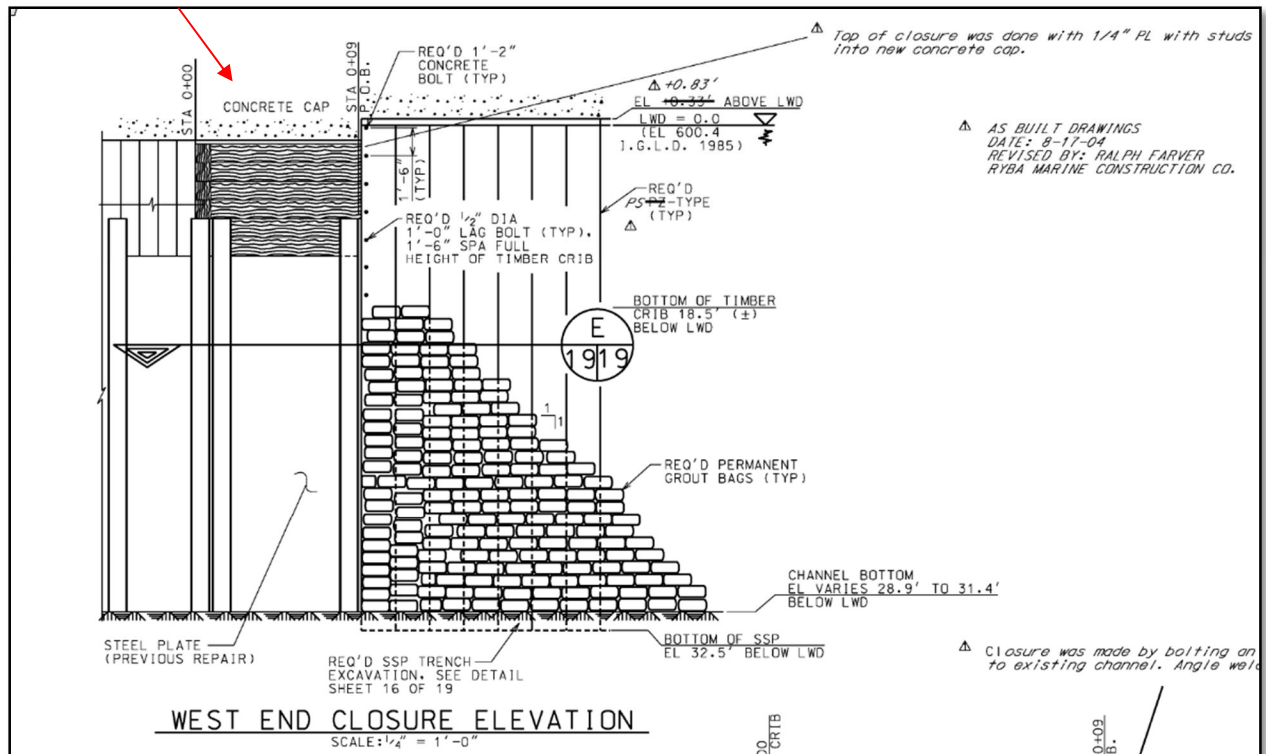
1994 Repair Drawings – Elevation (2020 Strike Location)
